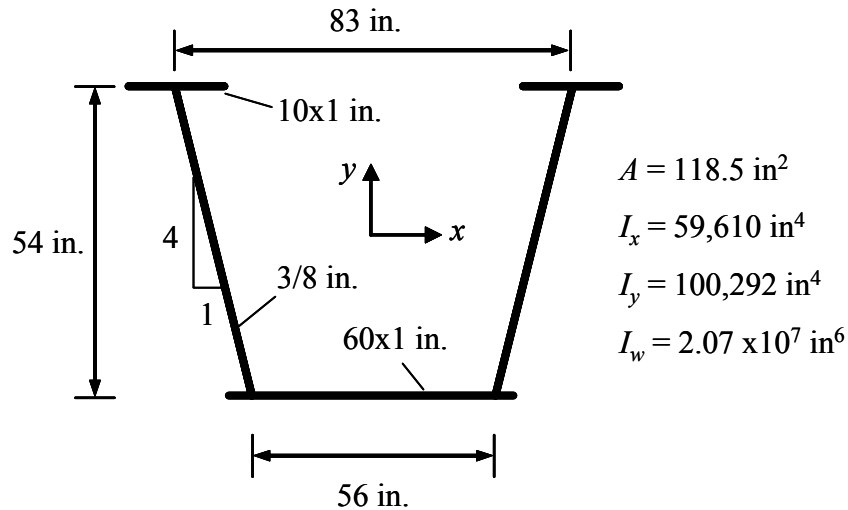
CROSS-SECTIONAL DIMENSIONS AND PROPERTIES
